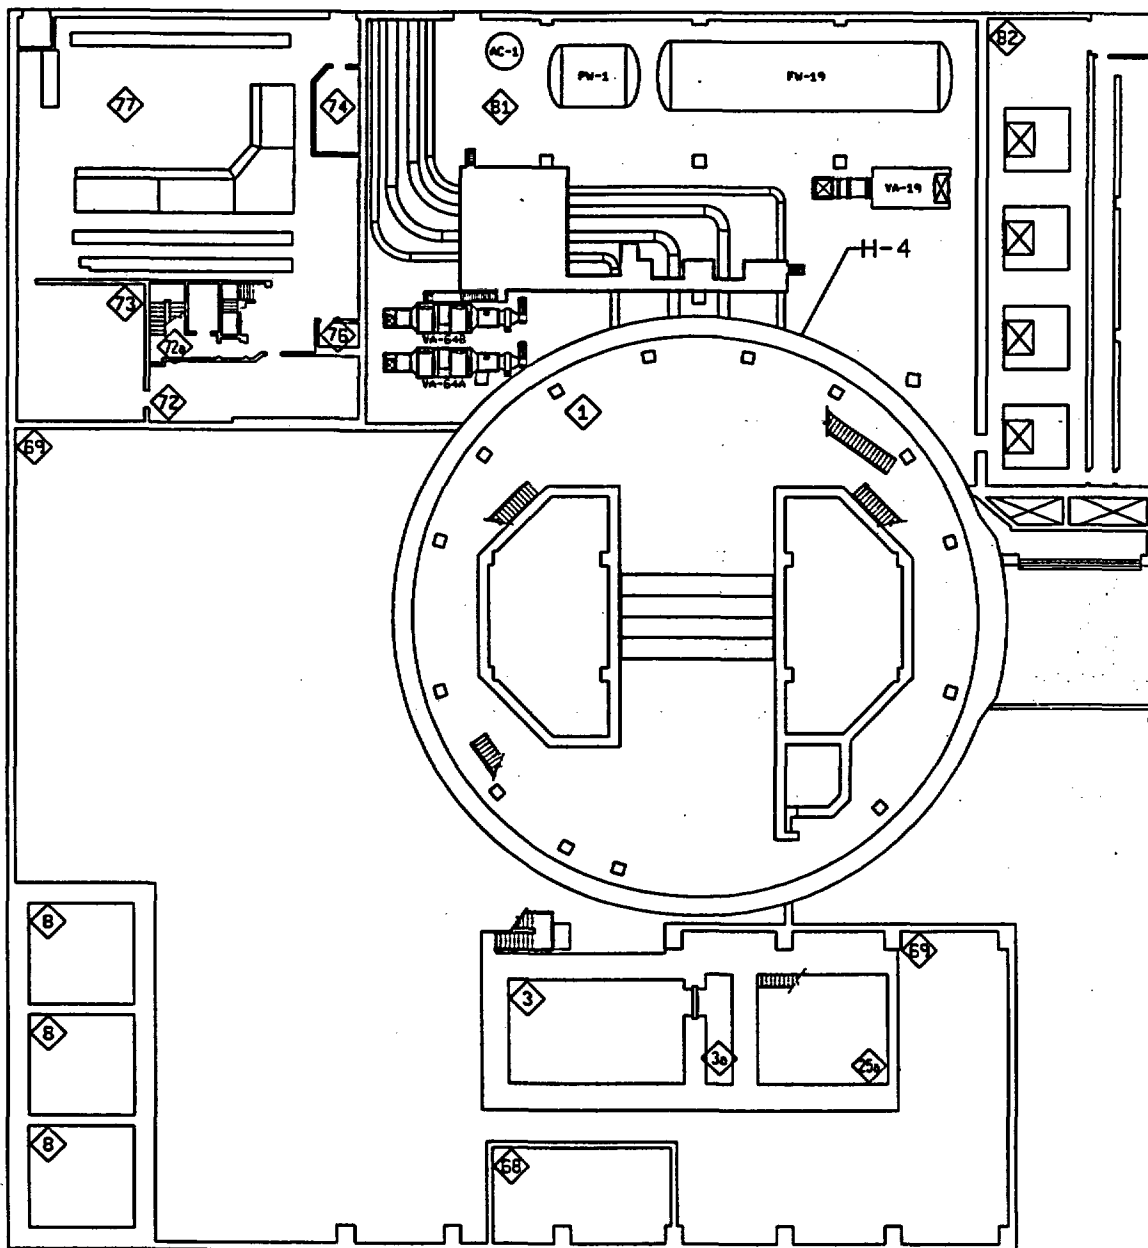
Auxiliary Building - Plant Elevation 1007'-0" & 1013'-0"
